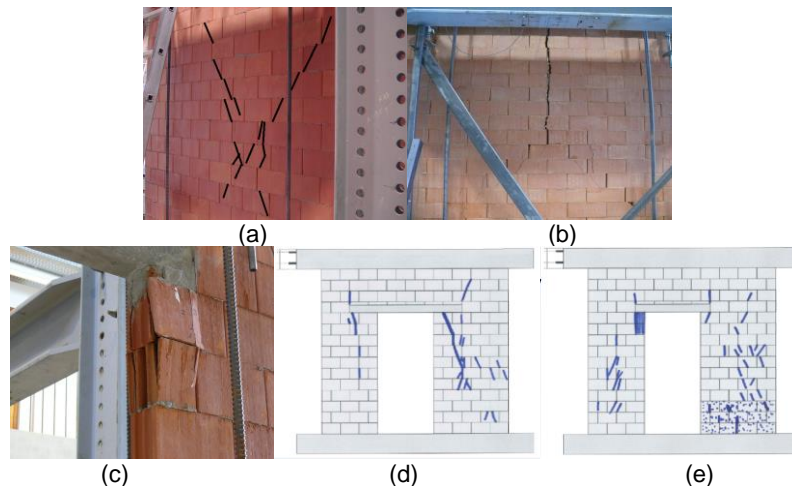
Crack patterns of the simple walls with/without rubber layers or an opening
